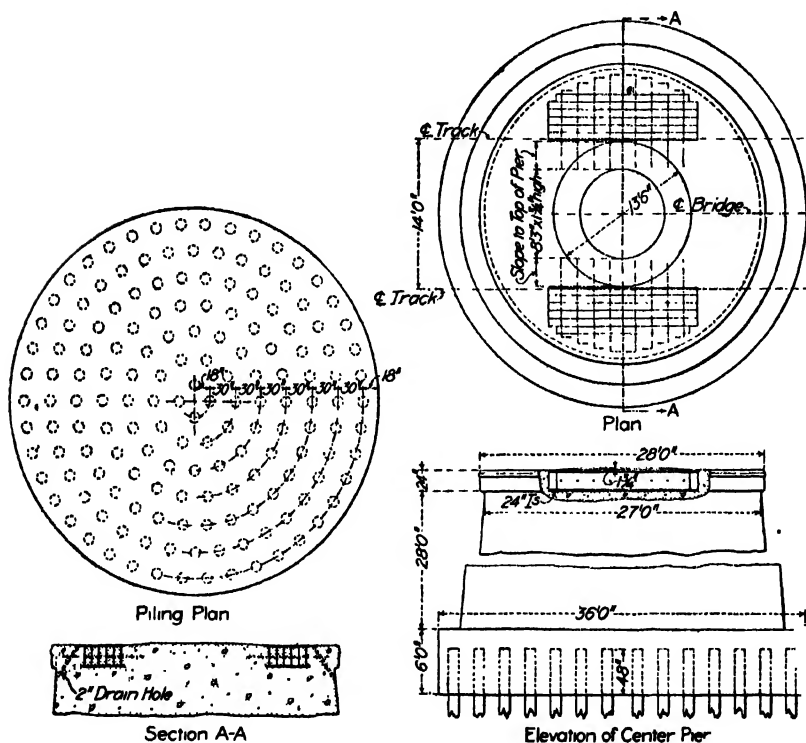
Concrete Pivot Pier, St. Louis River Bridge, Duluth, Minn.
